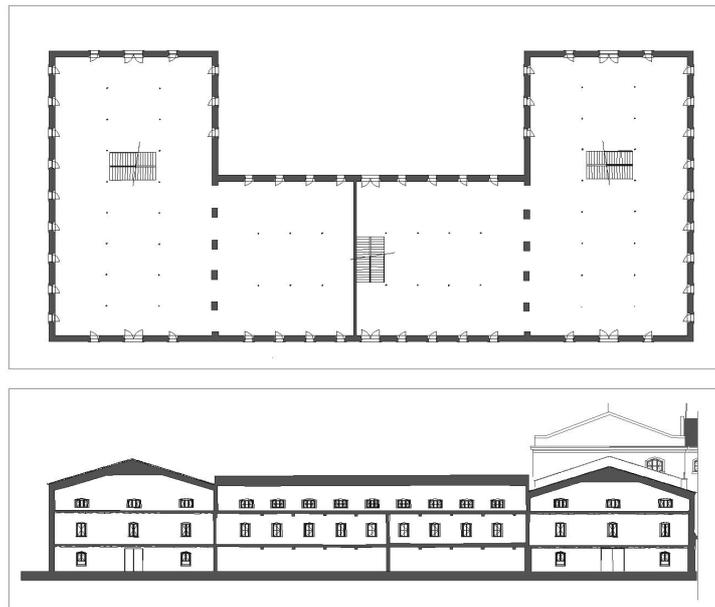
The Plan Layout and Section of “U” Shaped Building (Building number 7)
